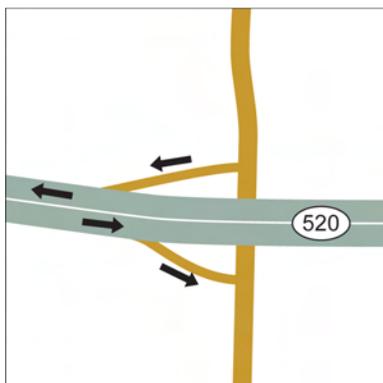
Evergreen Point Road Bridge Crossing
